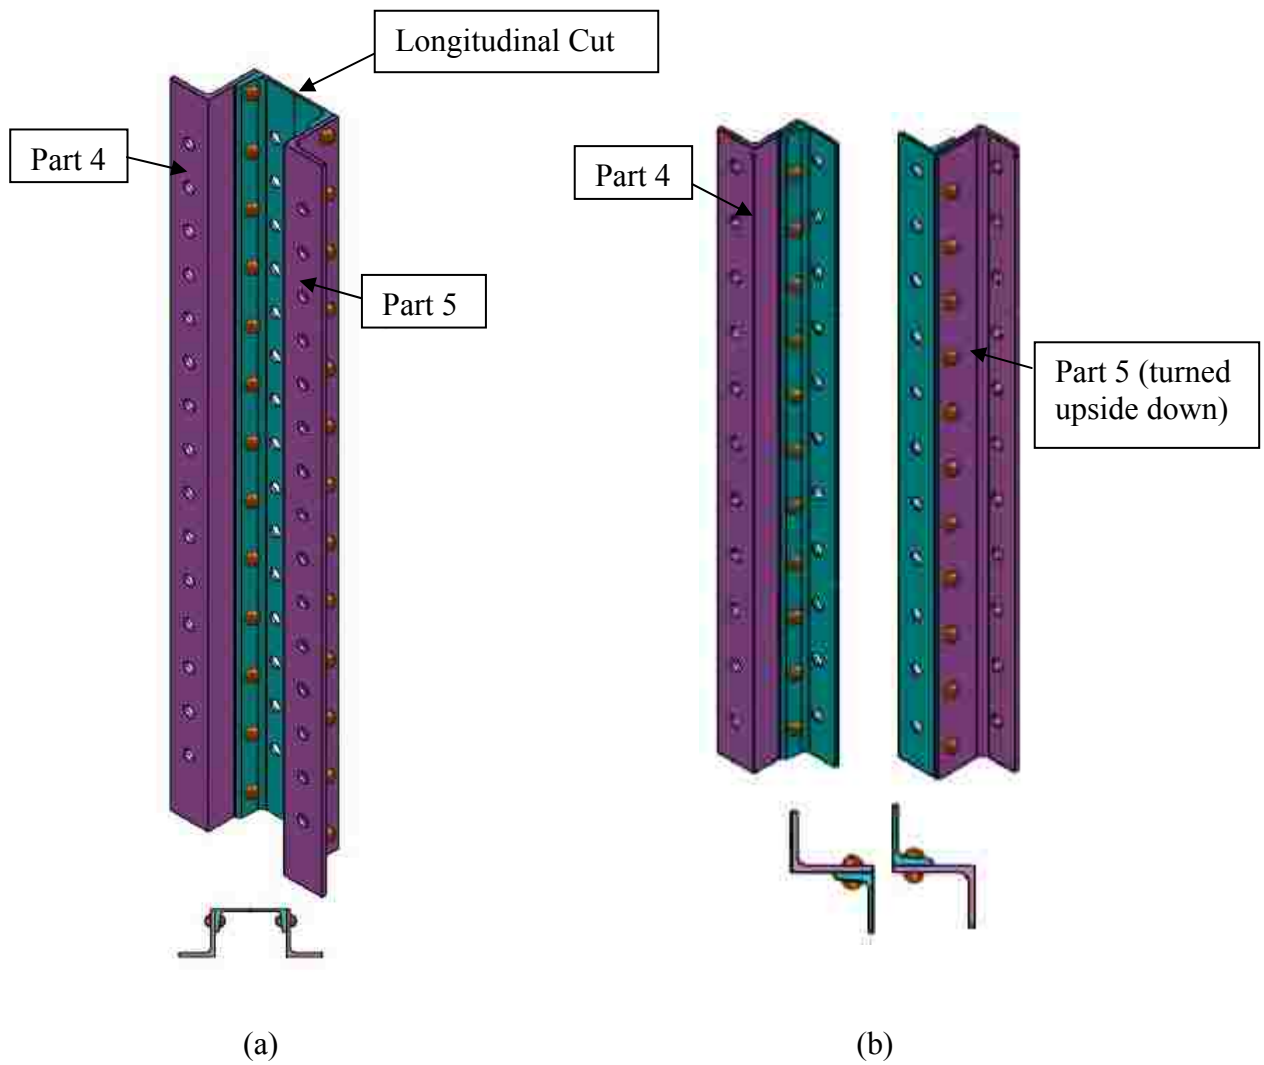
Fabrication of Guardrail for Test Specimen (a) Guardrail Prior to Longitudinal Cut (b) After Cut
